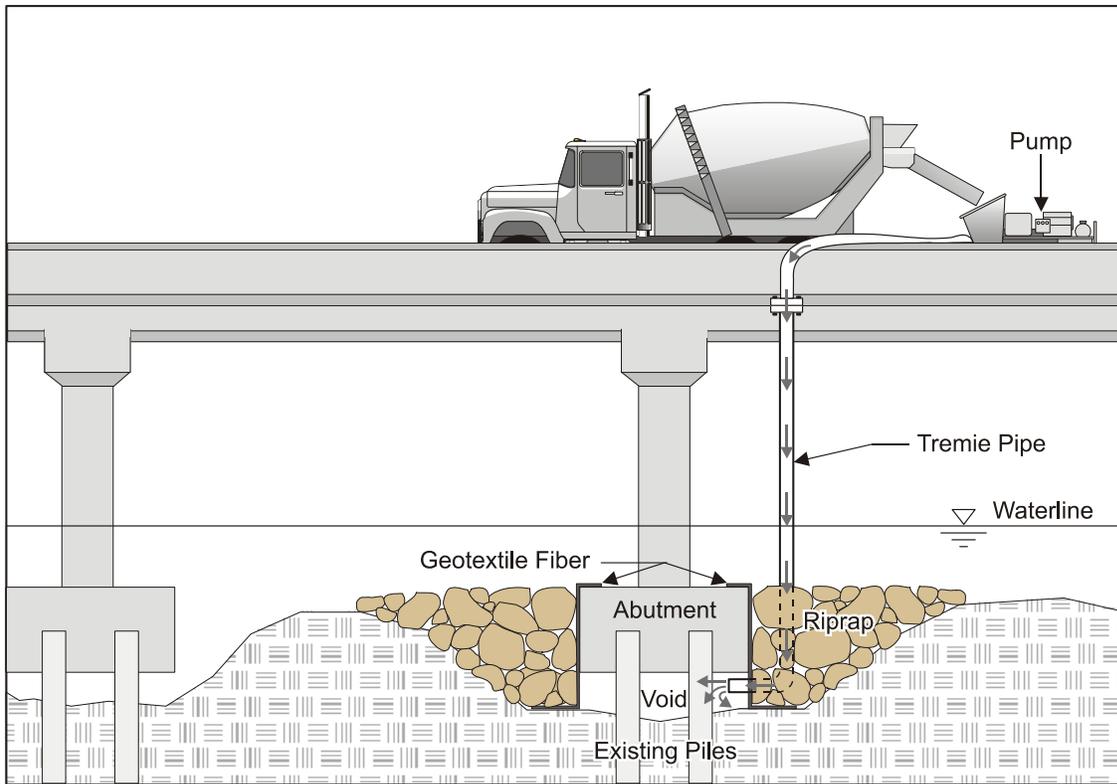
Typical Site Setup for Placing Concrete with Tremie Pipe
